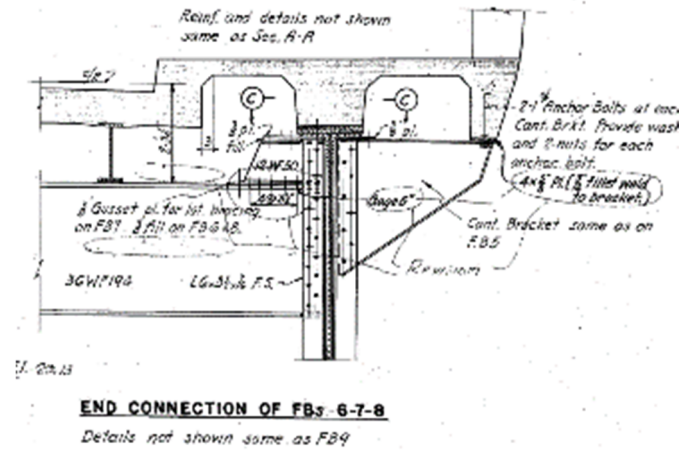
Detail of Interior Floor Beam at Flanking Span (1939 As-Built Plans)
